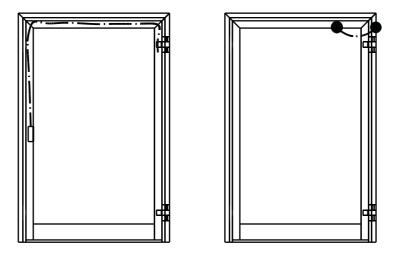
Power cable and protective conduits for electric locks (fitted in the door leaf or frame) - Add (2 examples shown)
